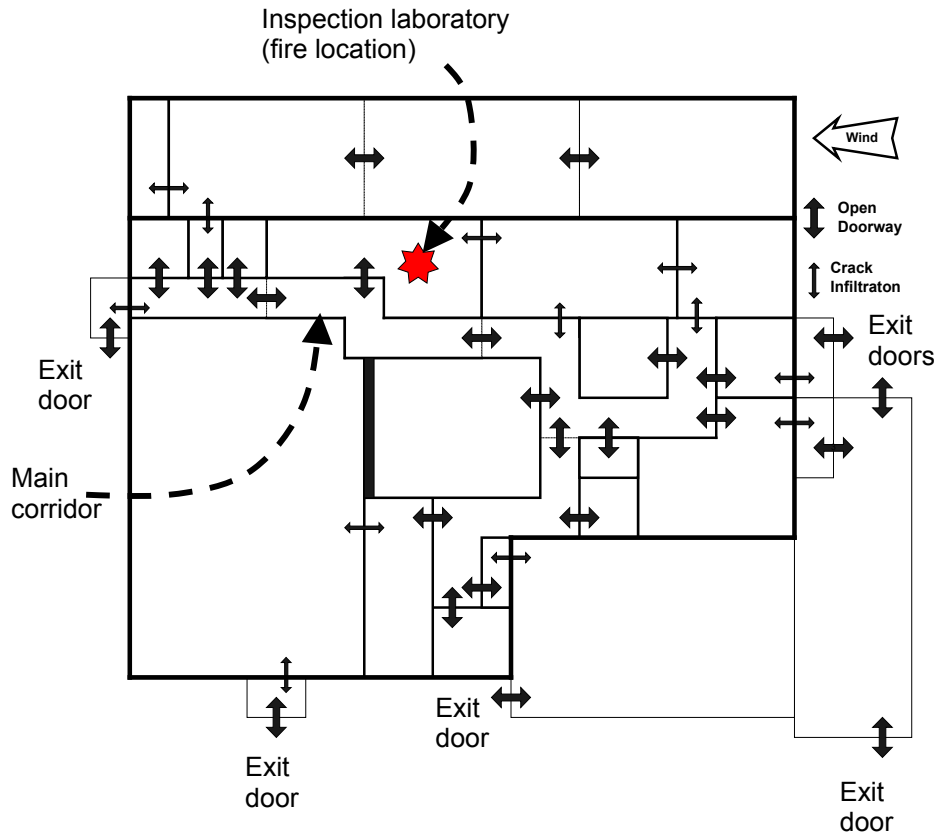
Floor Plan for the Main Floor of the Example Storage Facility
